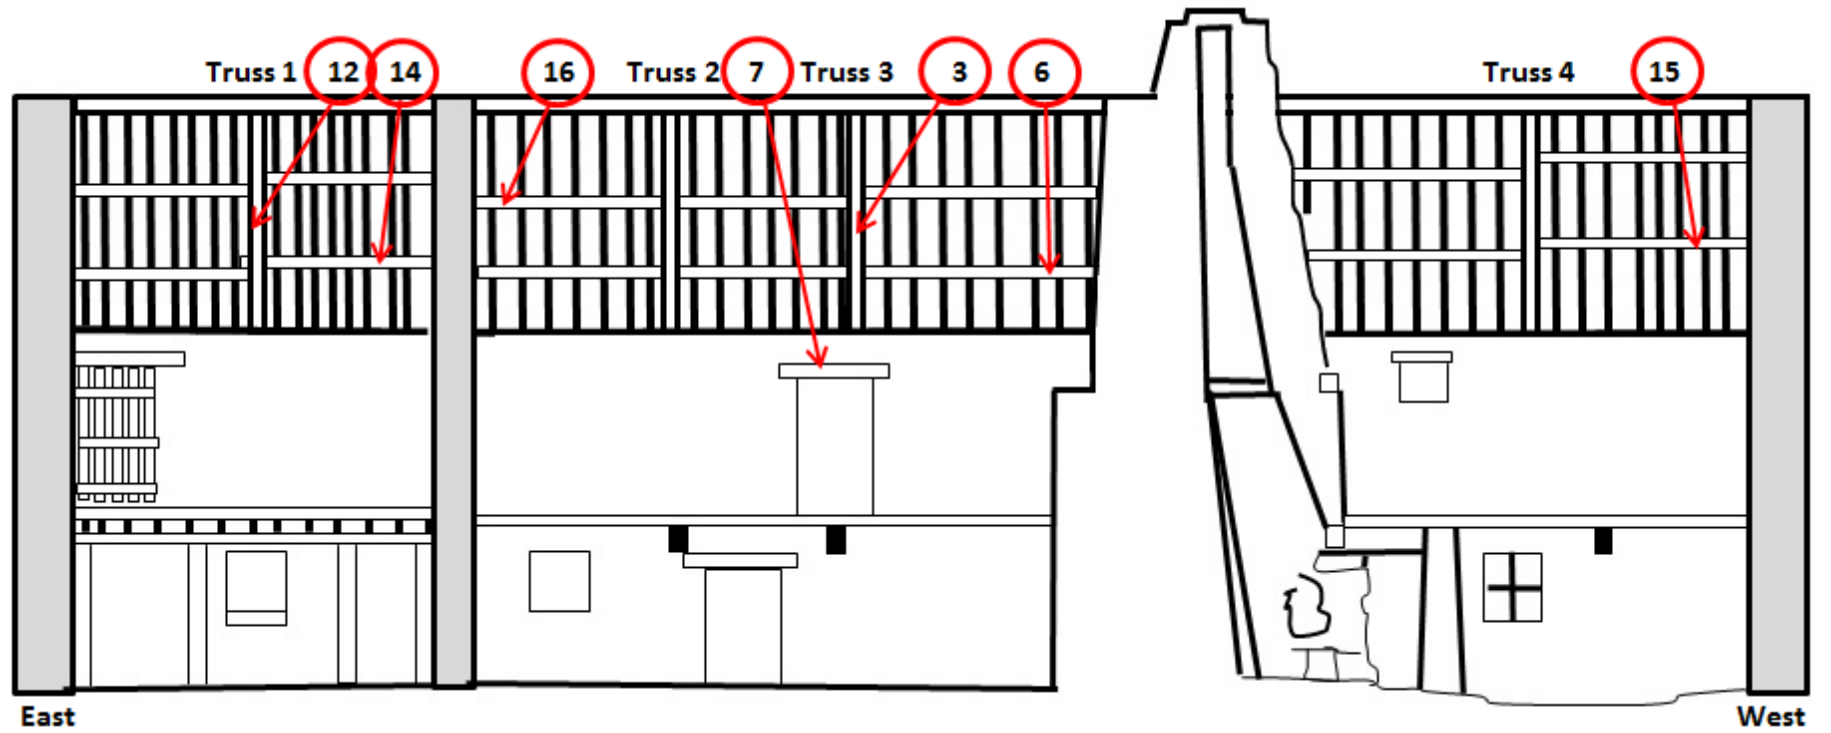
Long-section of the Former Farmhouse, viewed looking south, to locate sampled timbers (based on drawing in possession of the owners of unknown source)
